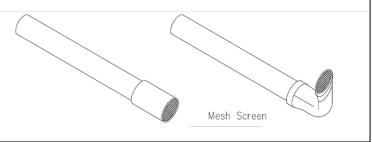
Screen Installation - NOTE: Vent termination elbow is meant to be installed open end facing the ground. Orientation in Figure 24 is meant to demonstrate proper Vent Screen installation ONLY.
